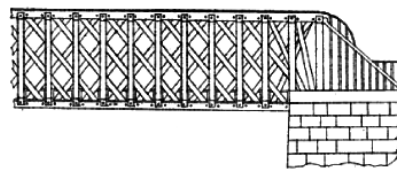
Drawing from Hermann Haupt's *General Theory of Bridge Construction*, 1863 plate 8.
